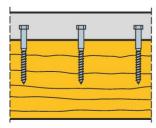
Typical sections of TCC slabs Shear connectors applied in TCC structures may be classified in dowel type steel fasteners, notches, combinations of steel fasteners and notches, and special types, e.g. glued connections. It is possible to incline the steel fasteners or arrange them in two rows if necessary, see Figure 2. Furthermore, the spacing of shear connectors may be changed in accordance to the shear force distribution along the longitudinal axis of the TCC structure.
